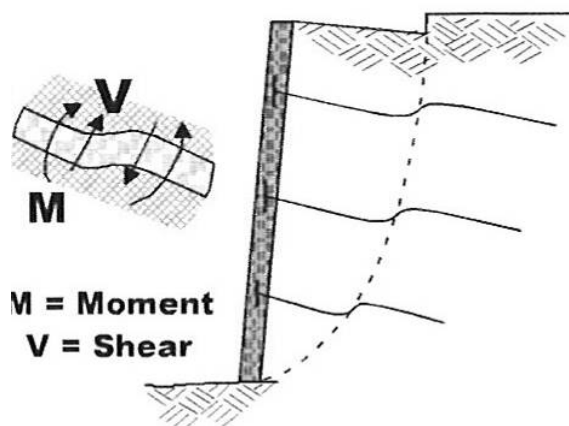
Nail bending and shear failure (FHWA, 2003)
